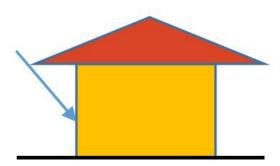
A diagram showing outer facade protection with the application of a wide set of eaves
